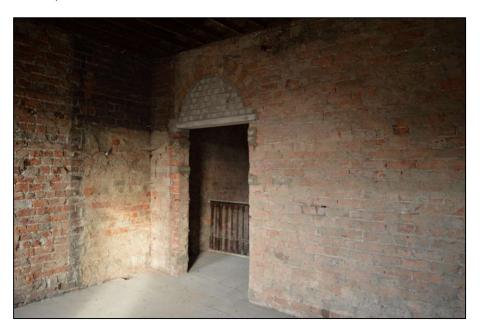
Partly blocked arched doorway in Room 3 on second floor (CPAT 4853-0012)
